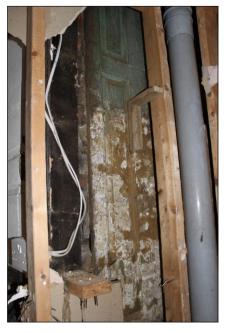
Unit 1A, timber panelling in the south corner of the ground floor, looking east-southeast
